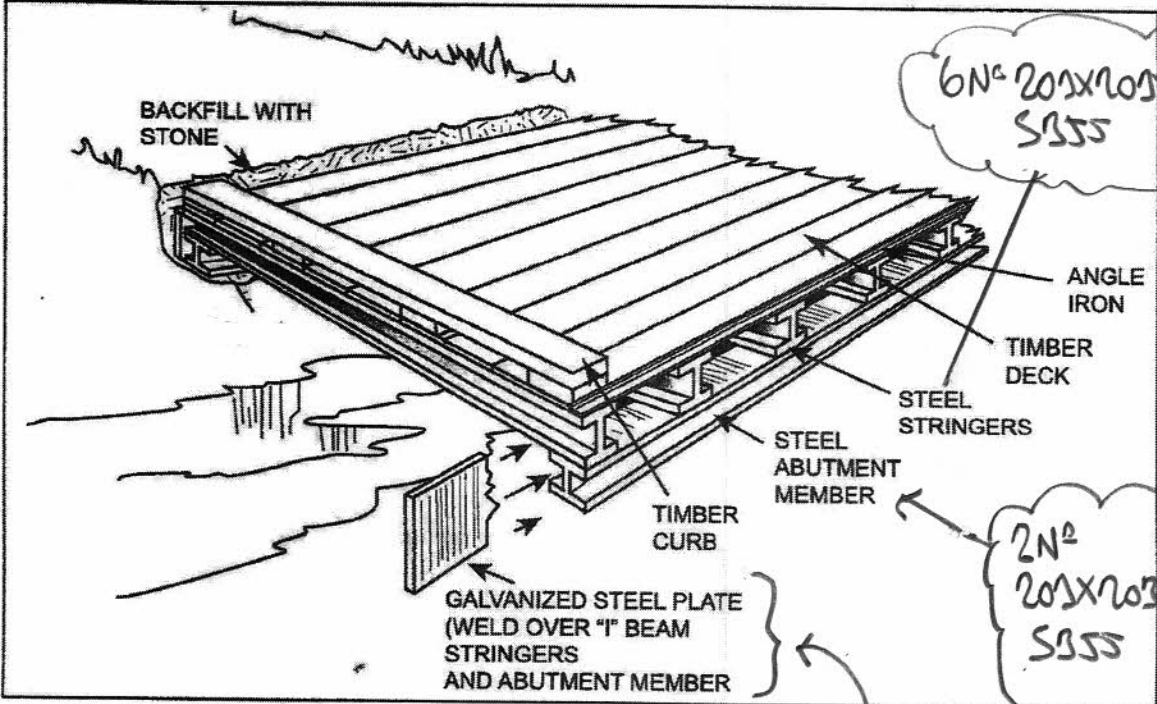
Perspective and section view of private bridge without concrete abutments
